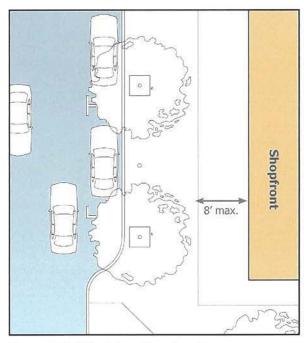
Plan View, Shopfront Frontage (Illustrative; canopy roof not shown)
